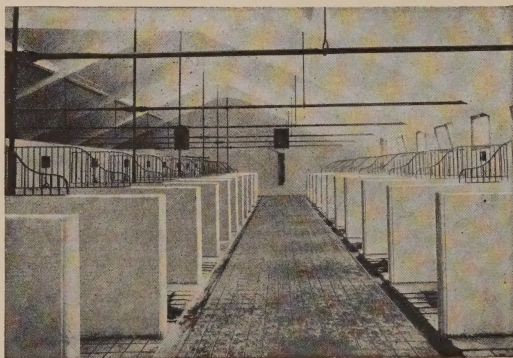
Interior of sanitary stable showing concrete floors and stalls.
